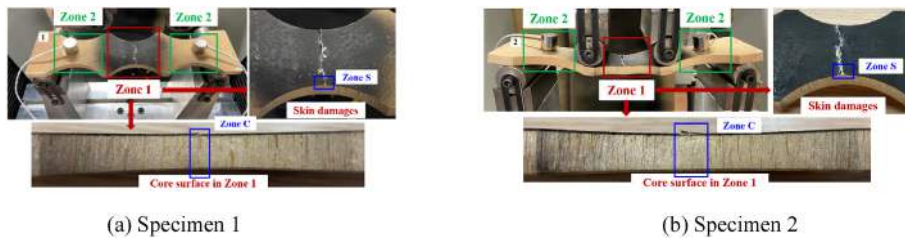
Fracture surfaces of GFRP-balsa sandwiches after 4-point bending tests.
